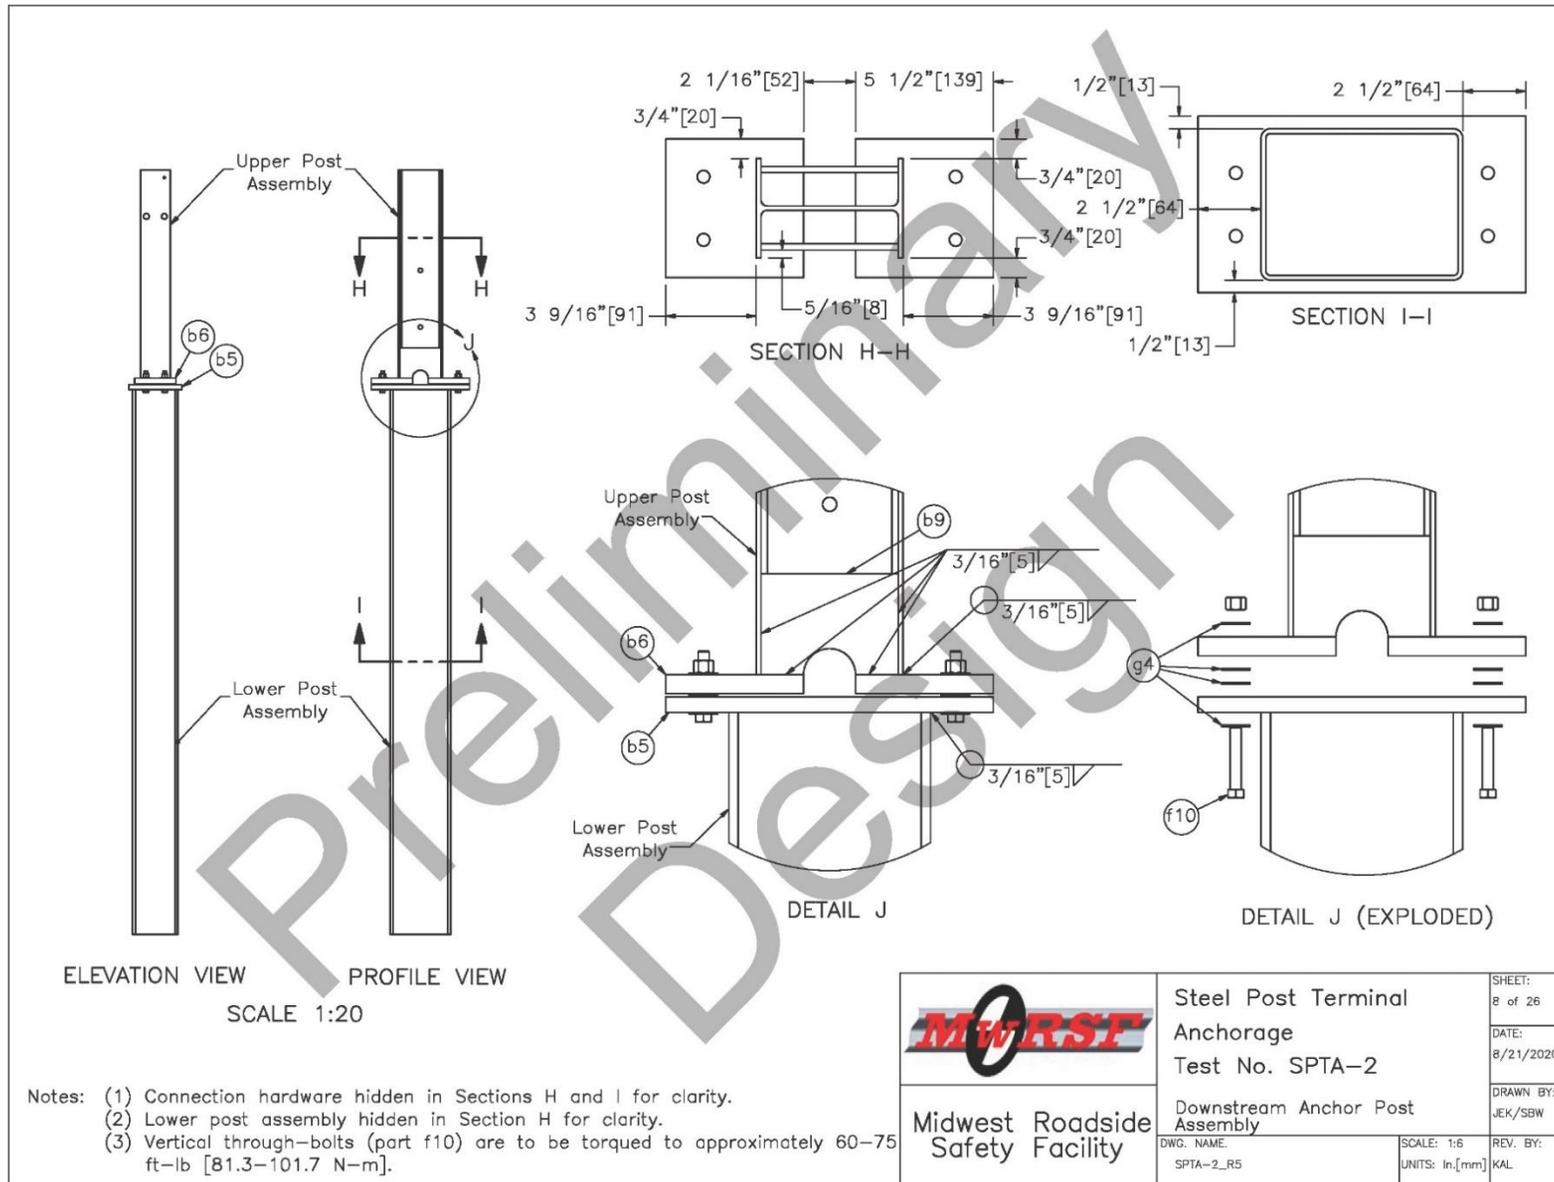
Downstream Anchor Post Assembly, Test No. SPTA-2
